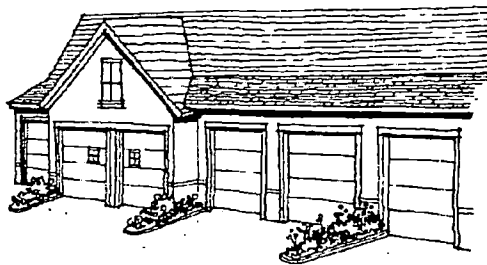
I: Landscaped peninsulas between garage doors
